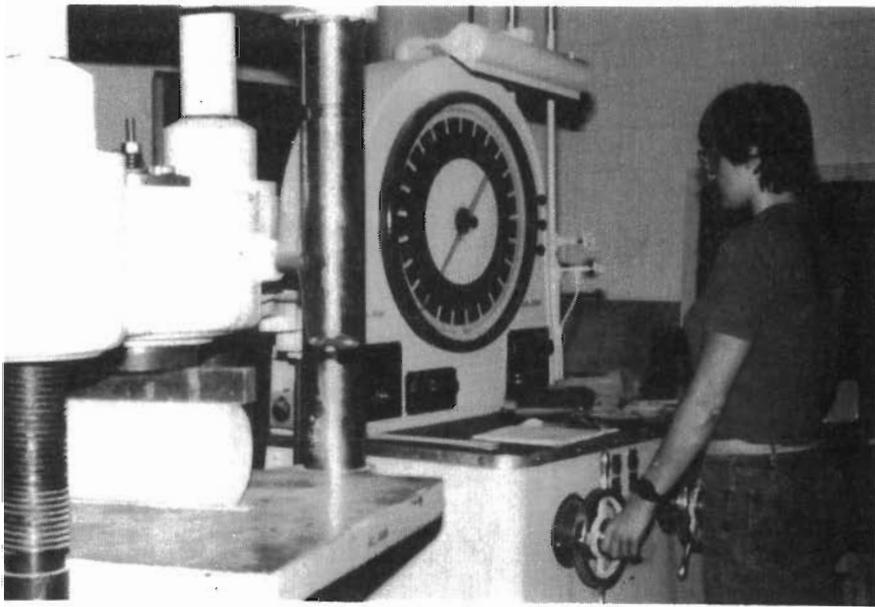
Loading 6 x 12-inch cylinder specimen.
